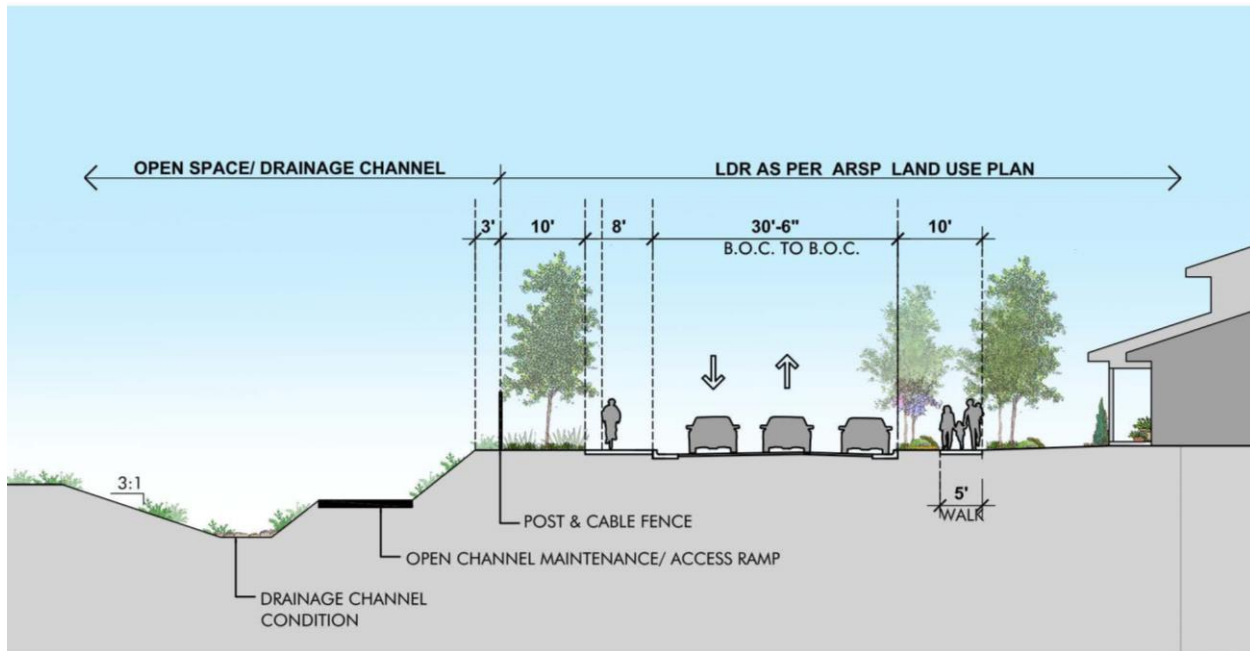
Typical Open Space Transition at Frontage Road (Section A-A)
